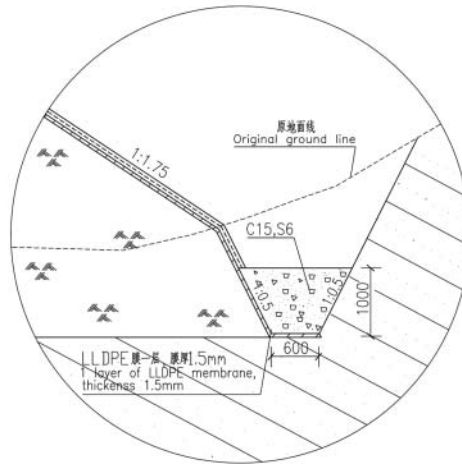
CIL Embankment Upstream Toe-drain Detail (NERIN, June 2005)
